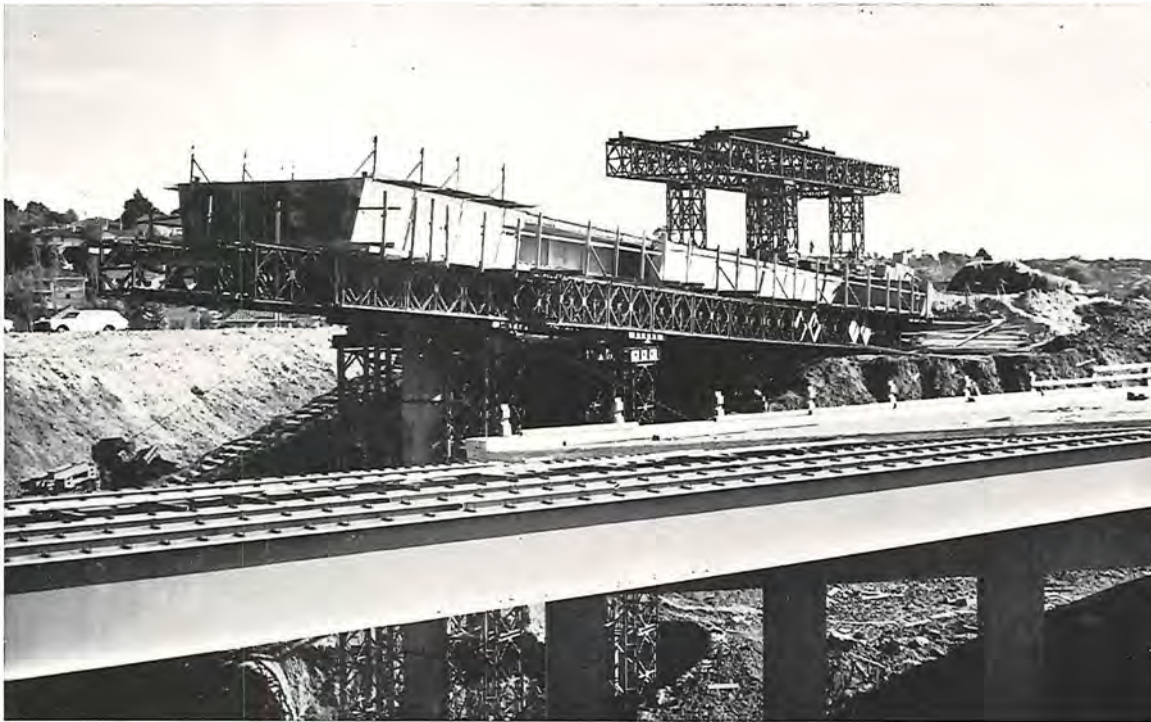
Western End of Bell Street Bridge Under Construction. The Structure in the Foreground is the North-bound Carriageway Bridge.
